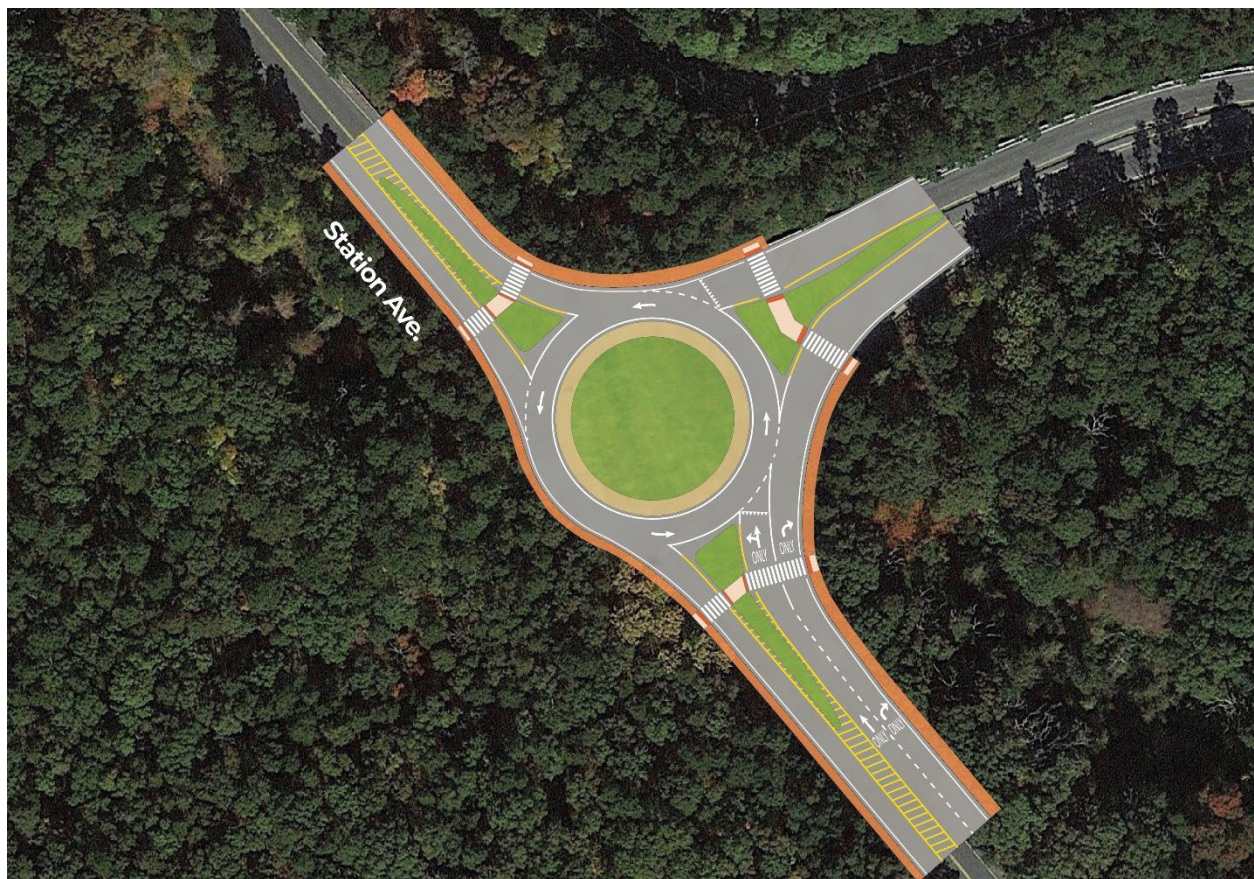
Roundabout Concept at Route 6 Westbound at Station Ave
